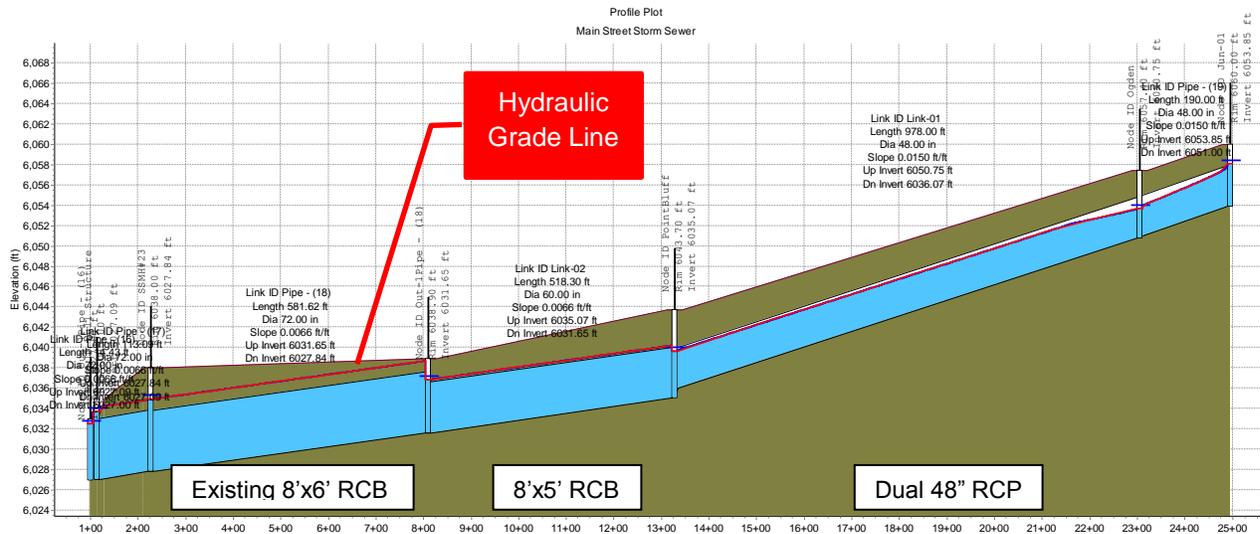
Design profile for storm sewer trunline (replacing existing drainage ditch).
